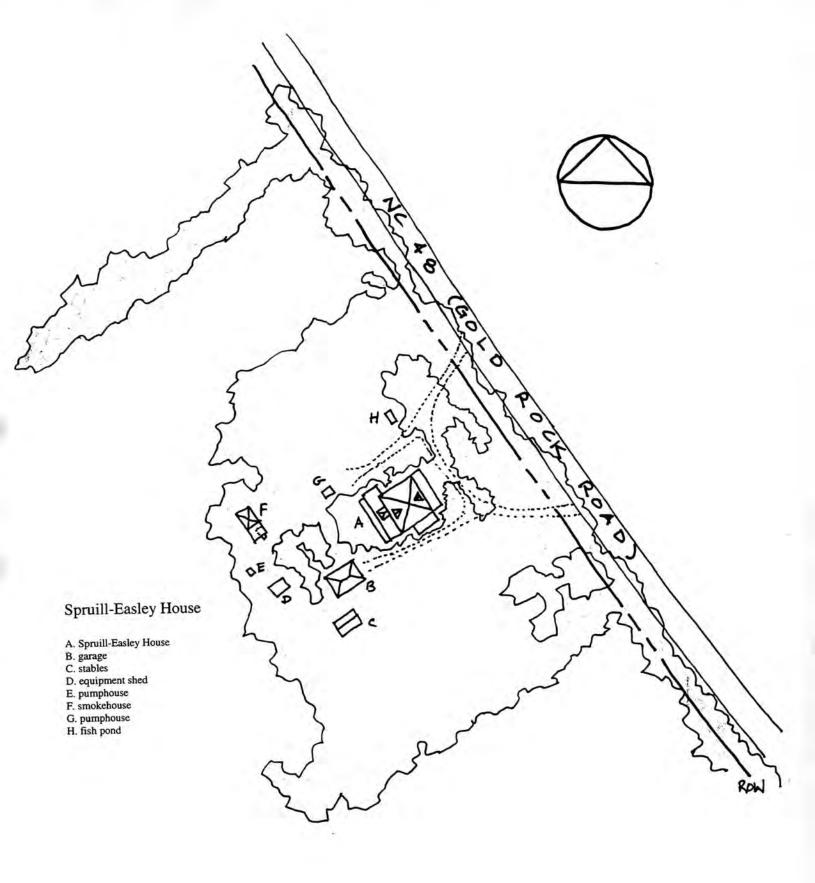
Spruill-Easley House Site Plan Not to Scale
